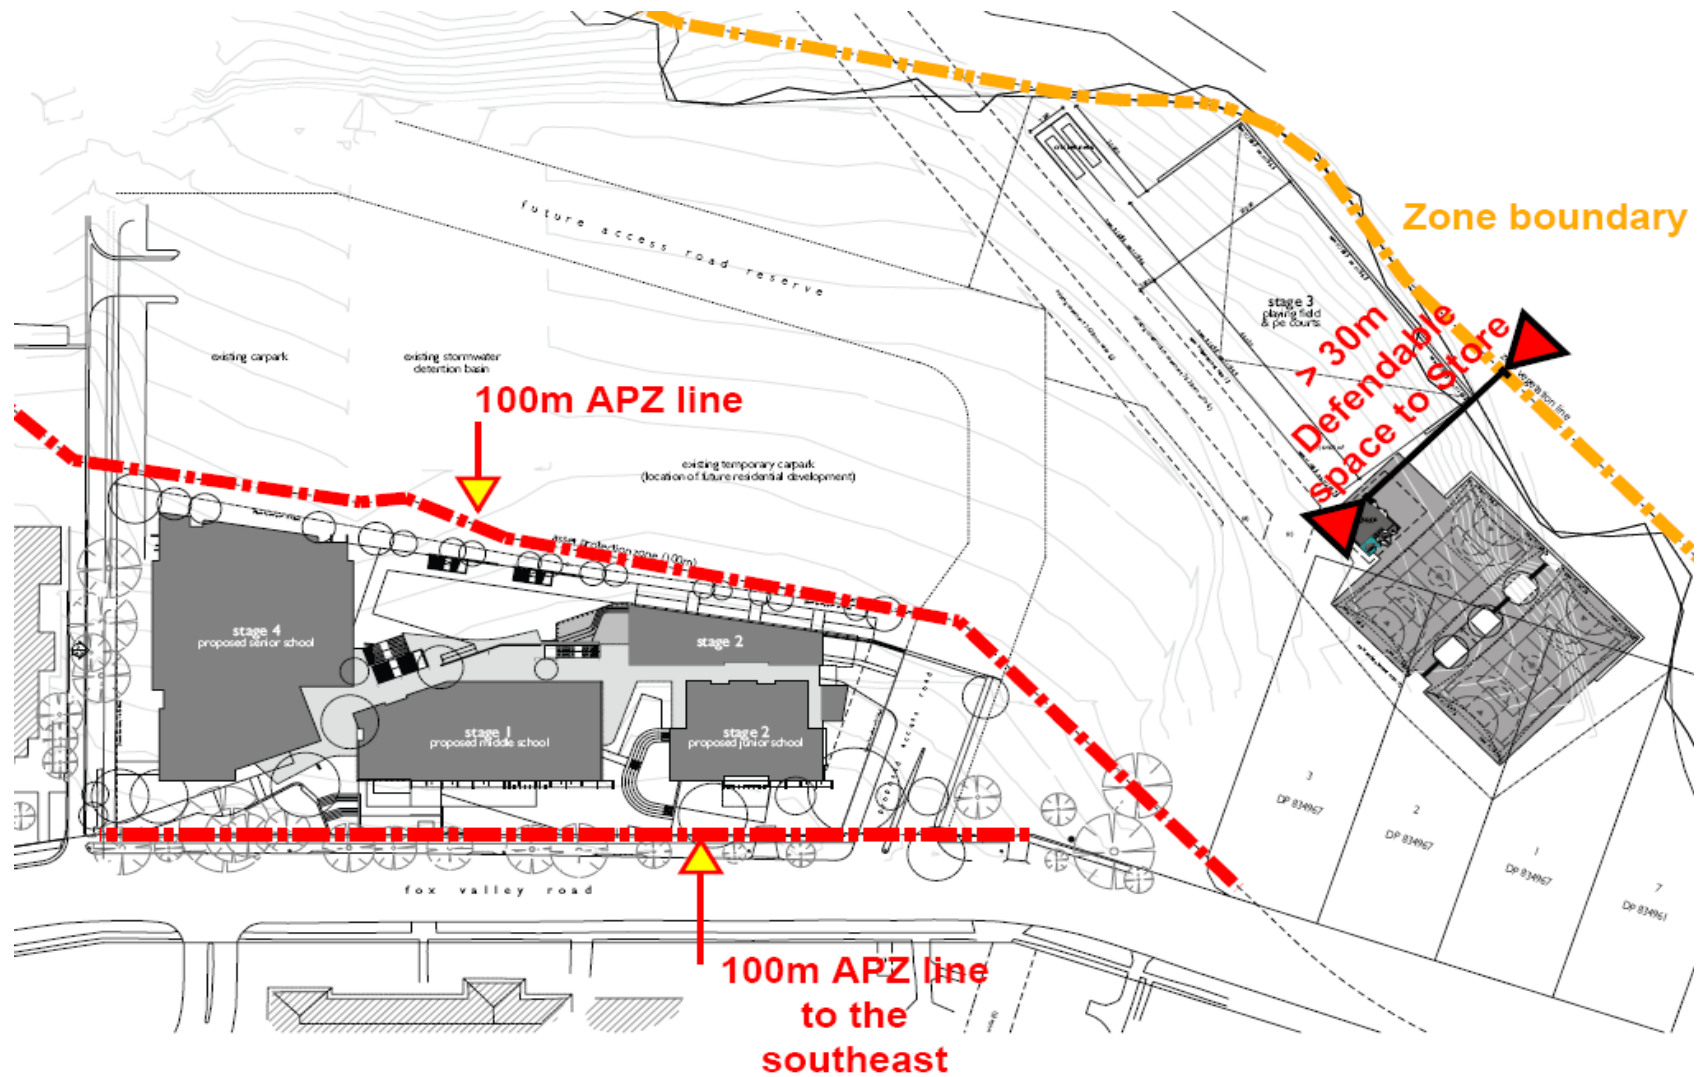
Site Plan of proposed Adventist Schooling showing setbacks to bushfire prone vegetation.
